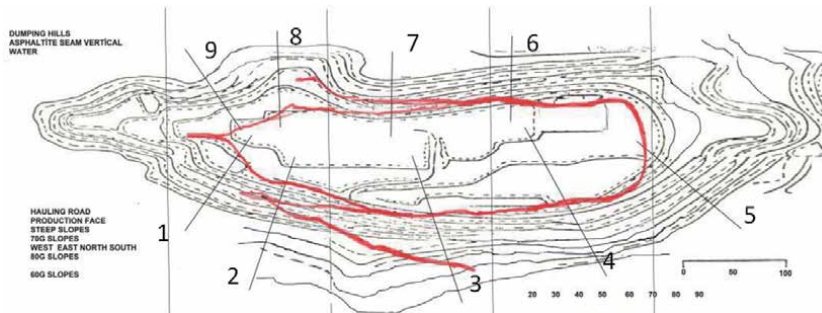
North and south steep slope faces of Avgamasya No. 1 pit of Şırnak asphaltite coal mine site and survey area with anchorage pattern.
